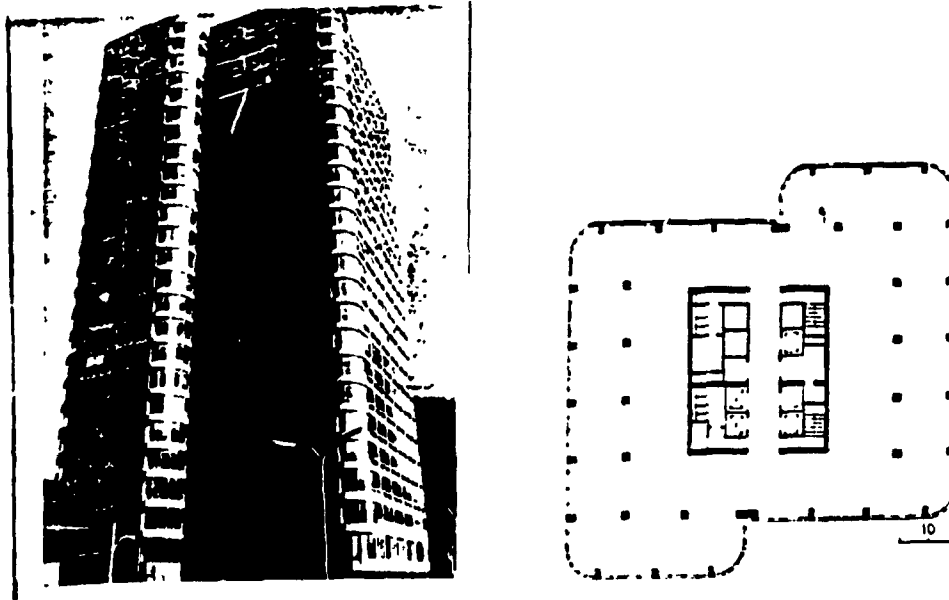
View and Plan of Office Tower, La Cite, Montreal.
